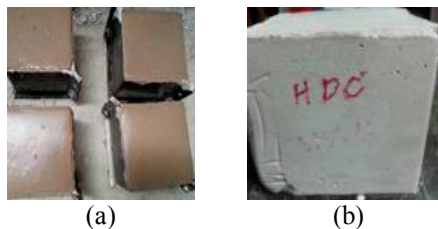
Sample fabrication (a) Hydration process in the mold (b) Finished sample
